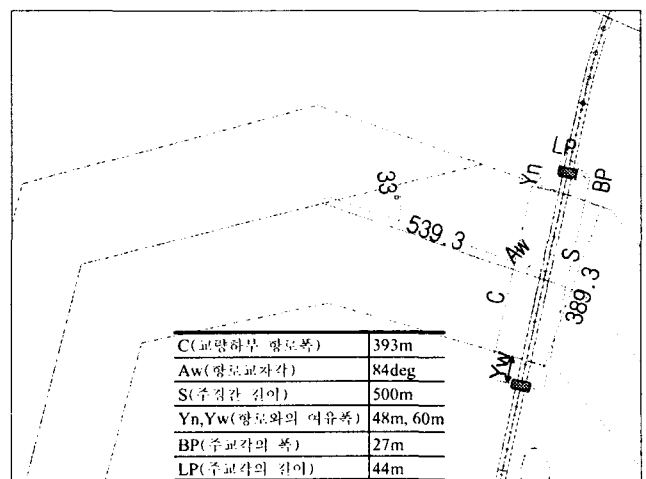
Channel layout and geometry in the vicinity of the bridge site.
